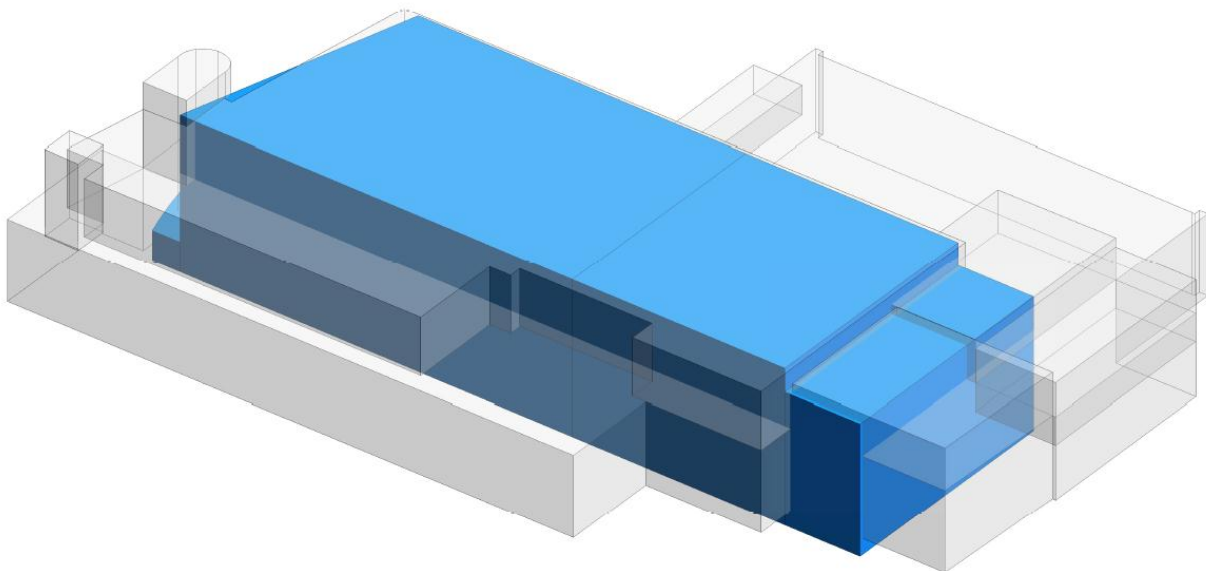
THE PROPOSED REDUCTION IN SCALE TO BUILDING D.
